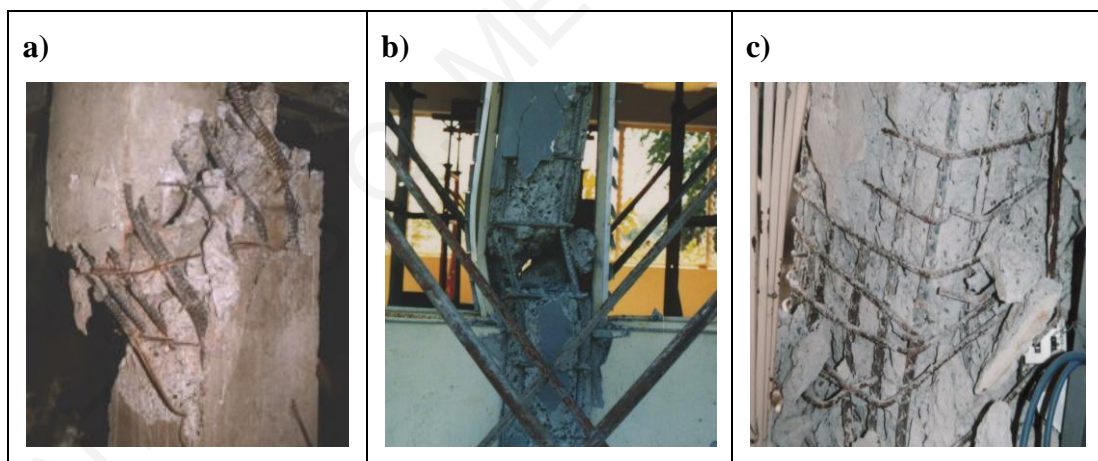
Brittle failure of old-type building columns. a) Thin and widely spaced plain bars as lateral reinforcement b) Spacing of the large diameter lateral reinforcement almost as wide as the width of the column c) Shear failure by opening of ties at a 90° bend.
